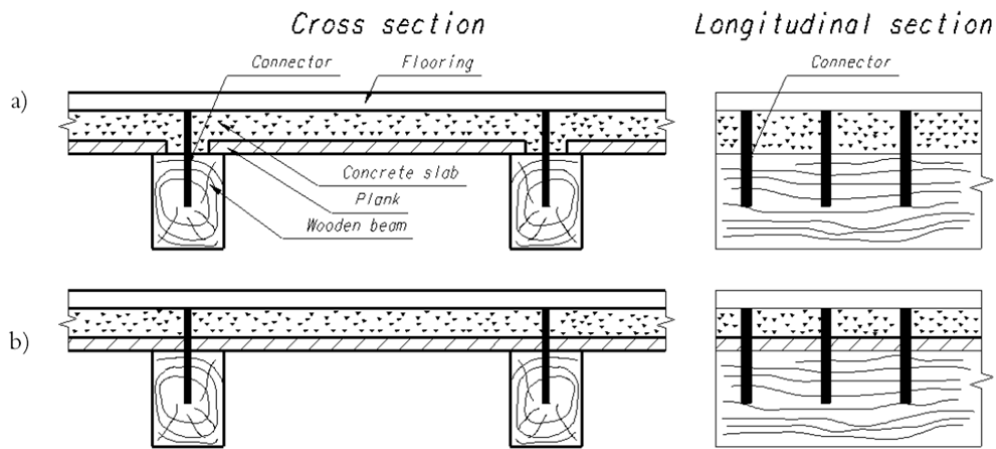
stud shear connectors for stiffening and strengthening wooden floors: direct contact connection (a) and interposed plank connection (b) (after Gelfi and Giuriani 1999)
